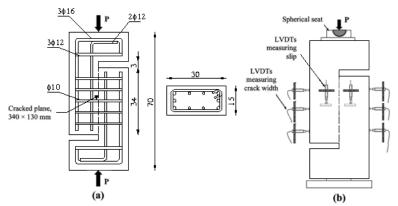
Test specimens and setup: (a) dimensions and reinforcement details; (b) schematic of test setup.
